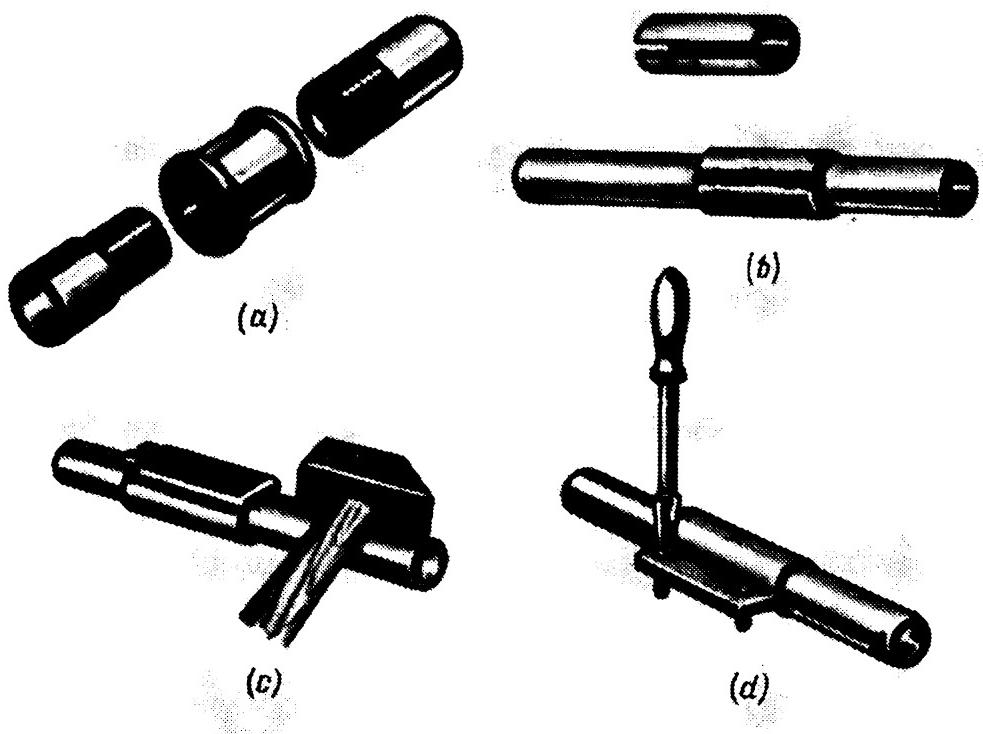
Methods of connection of exposed thin-walled steel pipes
